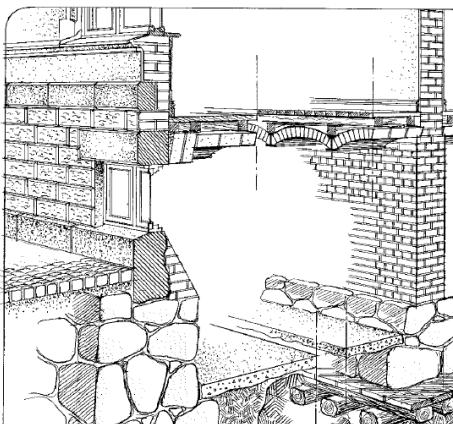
Non-reinforced concrete as ground slab (Björk et al., 2013).
